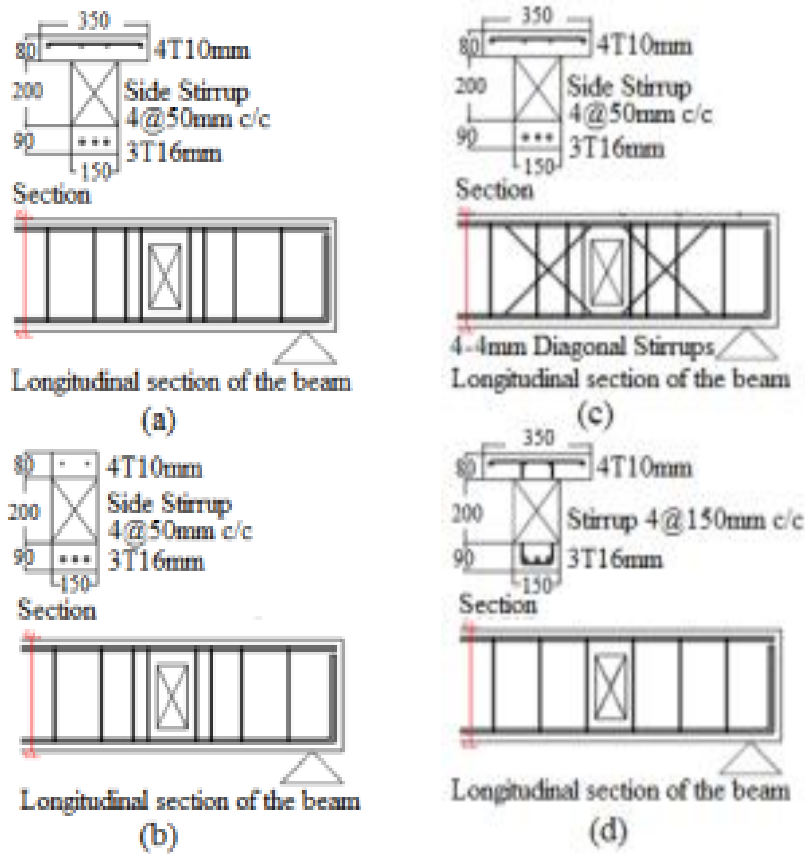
Detail of; (a) T2, TS2, and TP2 beams (b) R2 beam (c) TX2 beam (d) AS2 beam.
